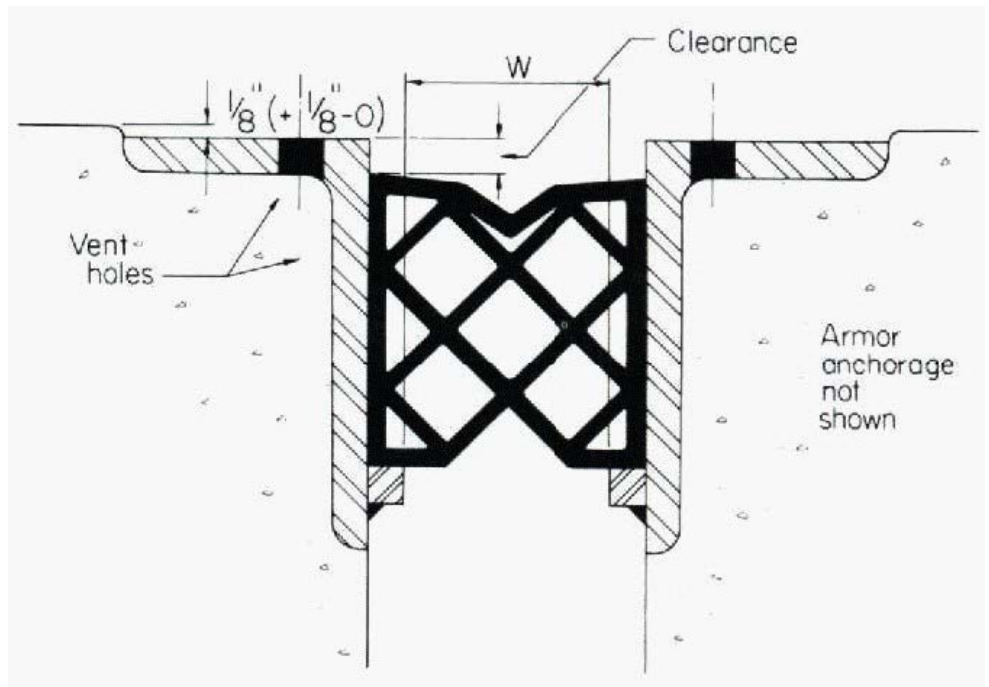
Cross Section of a Compression Joint Seal with Steel Angle Armoring
